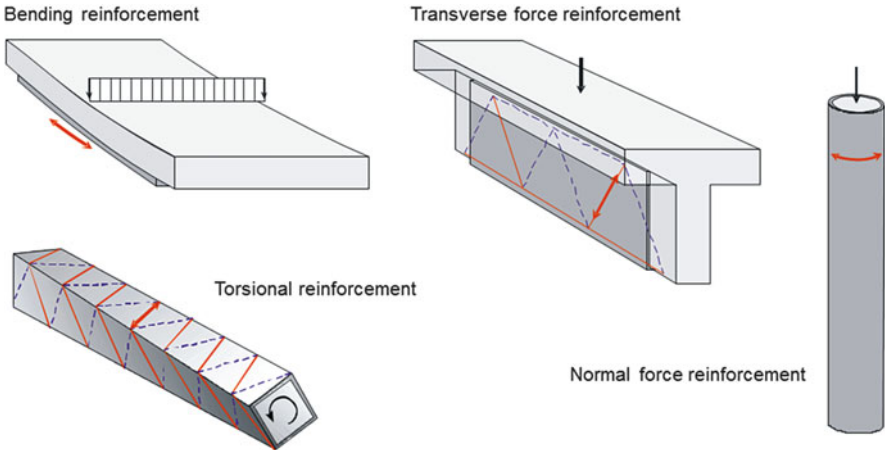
Possibilities of textile-reinforced concrete reinforcements
